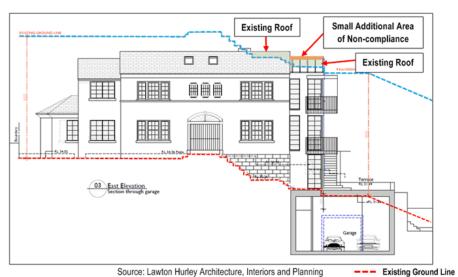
Existing and Proposed Building Height --- LEP Height Limit
